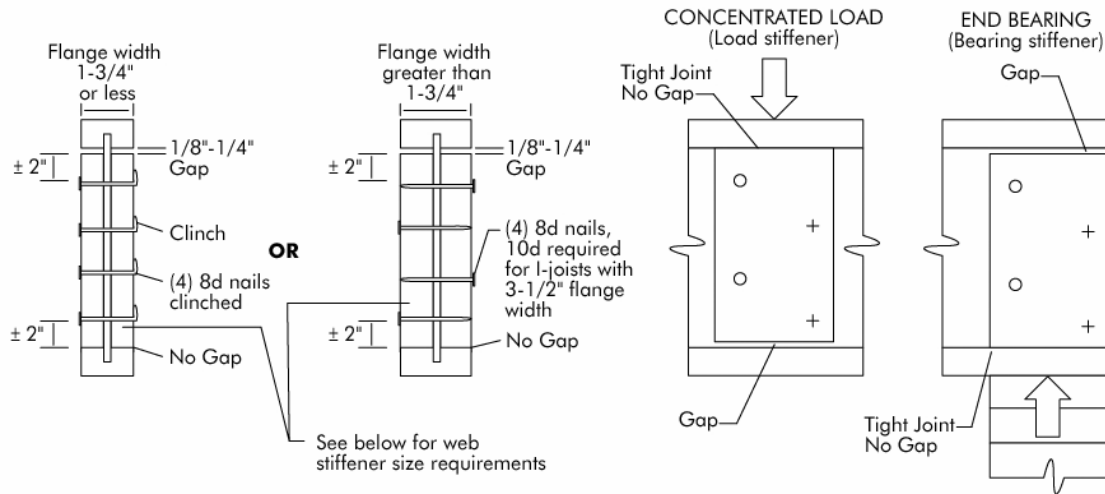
PRI I-JOIST WEB STIFFENER CONSTRUCTION DETAILS
